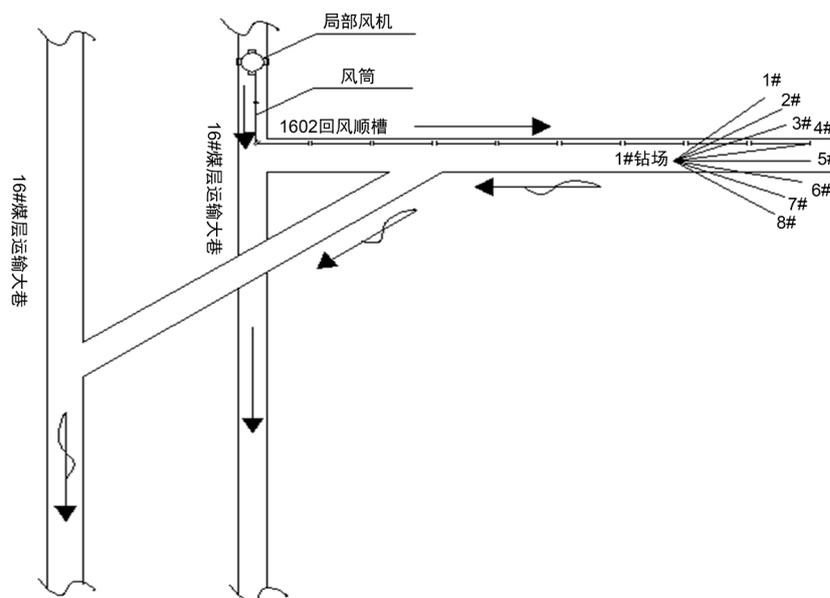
Schematic diagram of grouting drilling of 1602 mechanized excavation face in Lisheng coal mine
